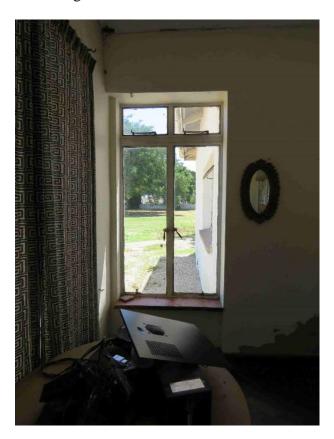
Internal viw of additions to the front of the house, showing steel-frame windows, in contrast with original timber-framed windows and doors
